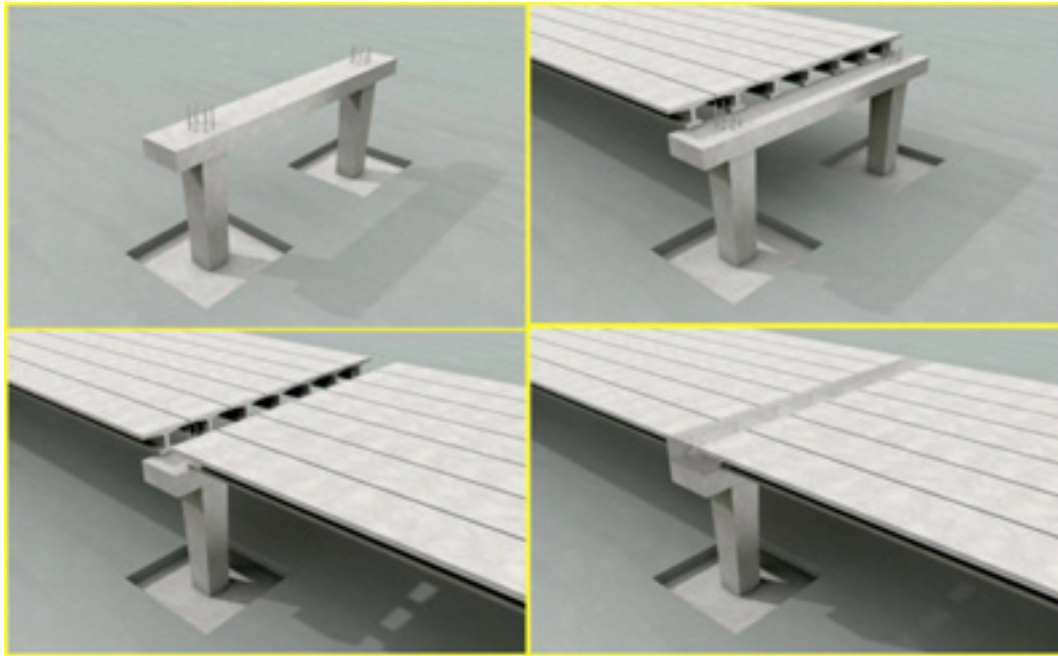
A typical Washington State Department of Transportation prestressed girder bridge with lower bent cap and integral joint.
